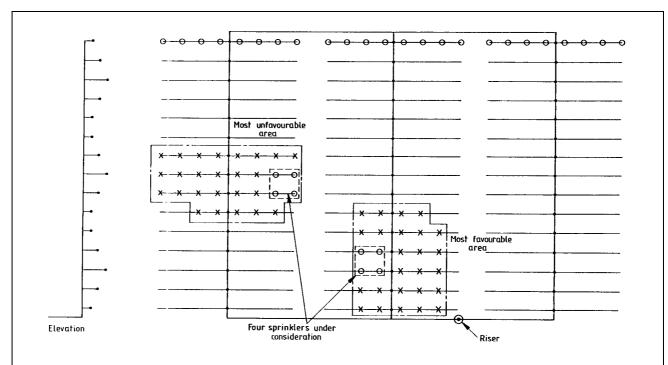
Typical hydraulically most favourable/unfavourable locations of AMAO in an installation with looped distribution piping
